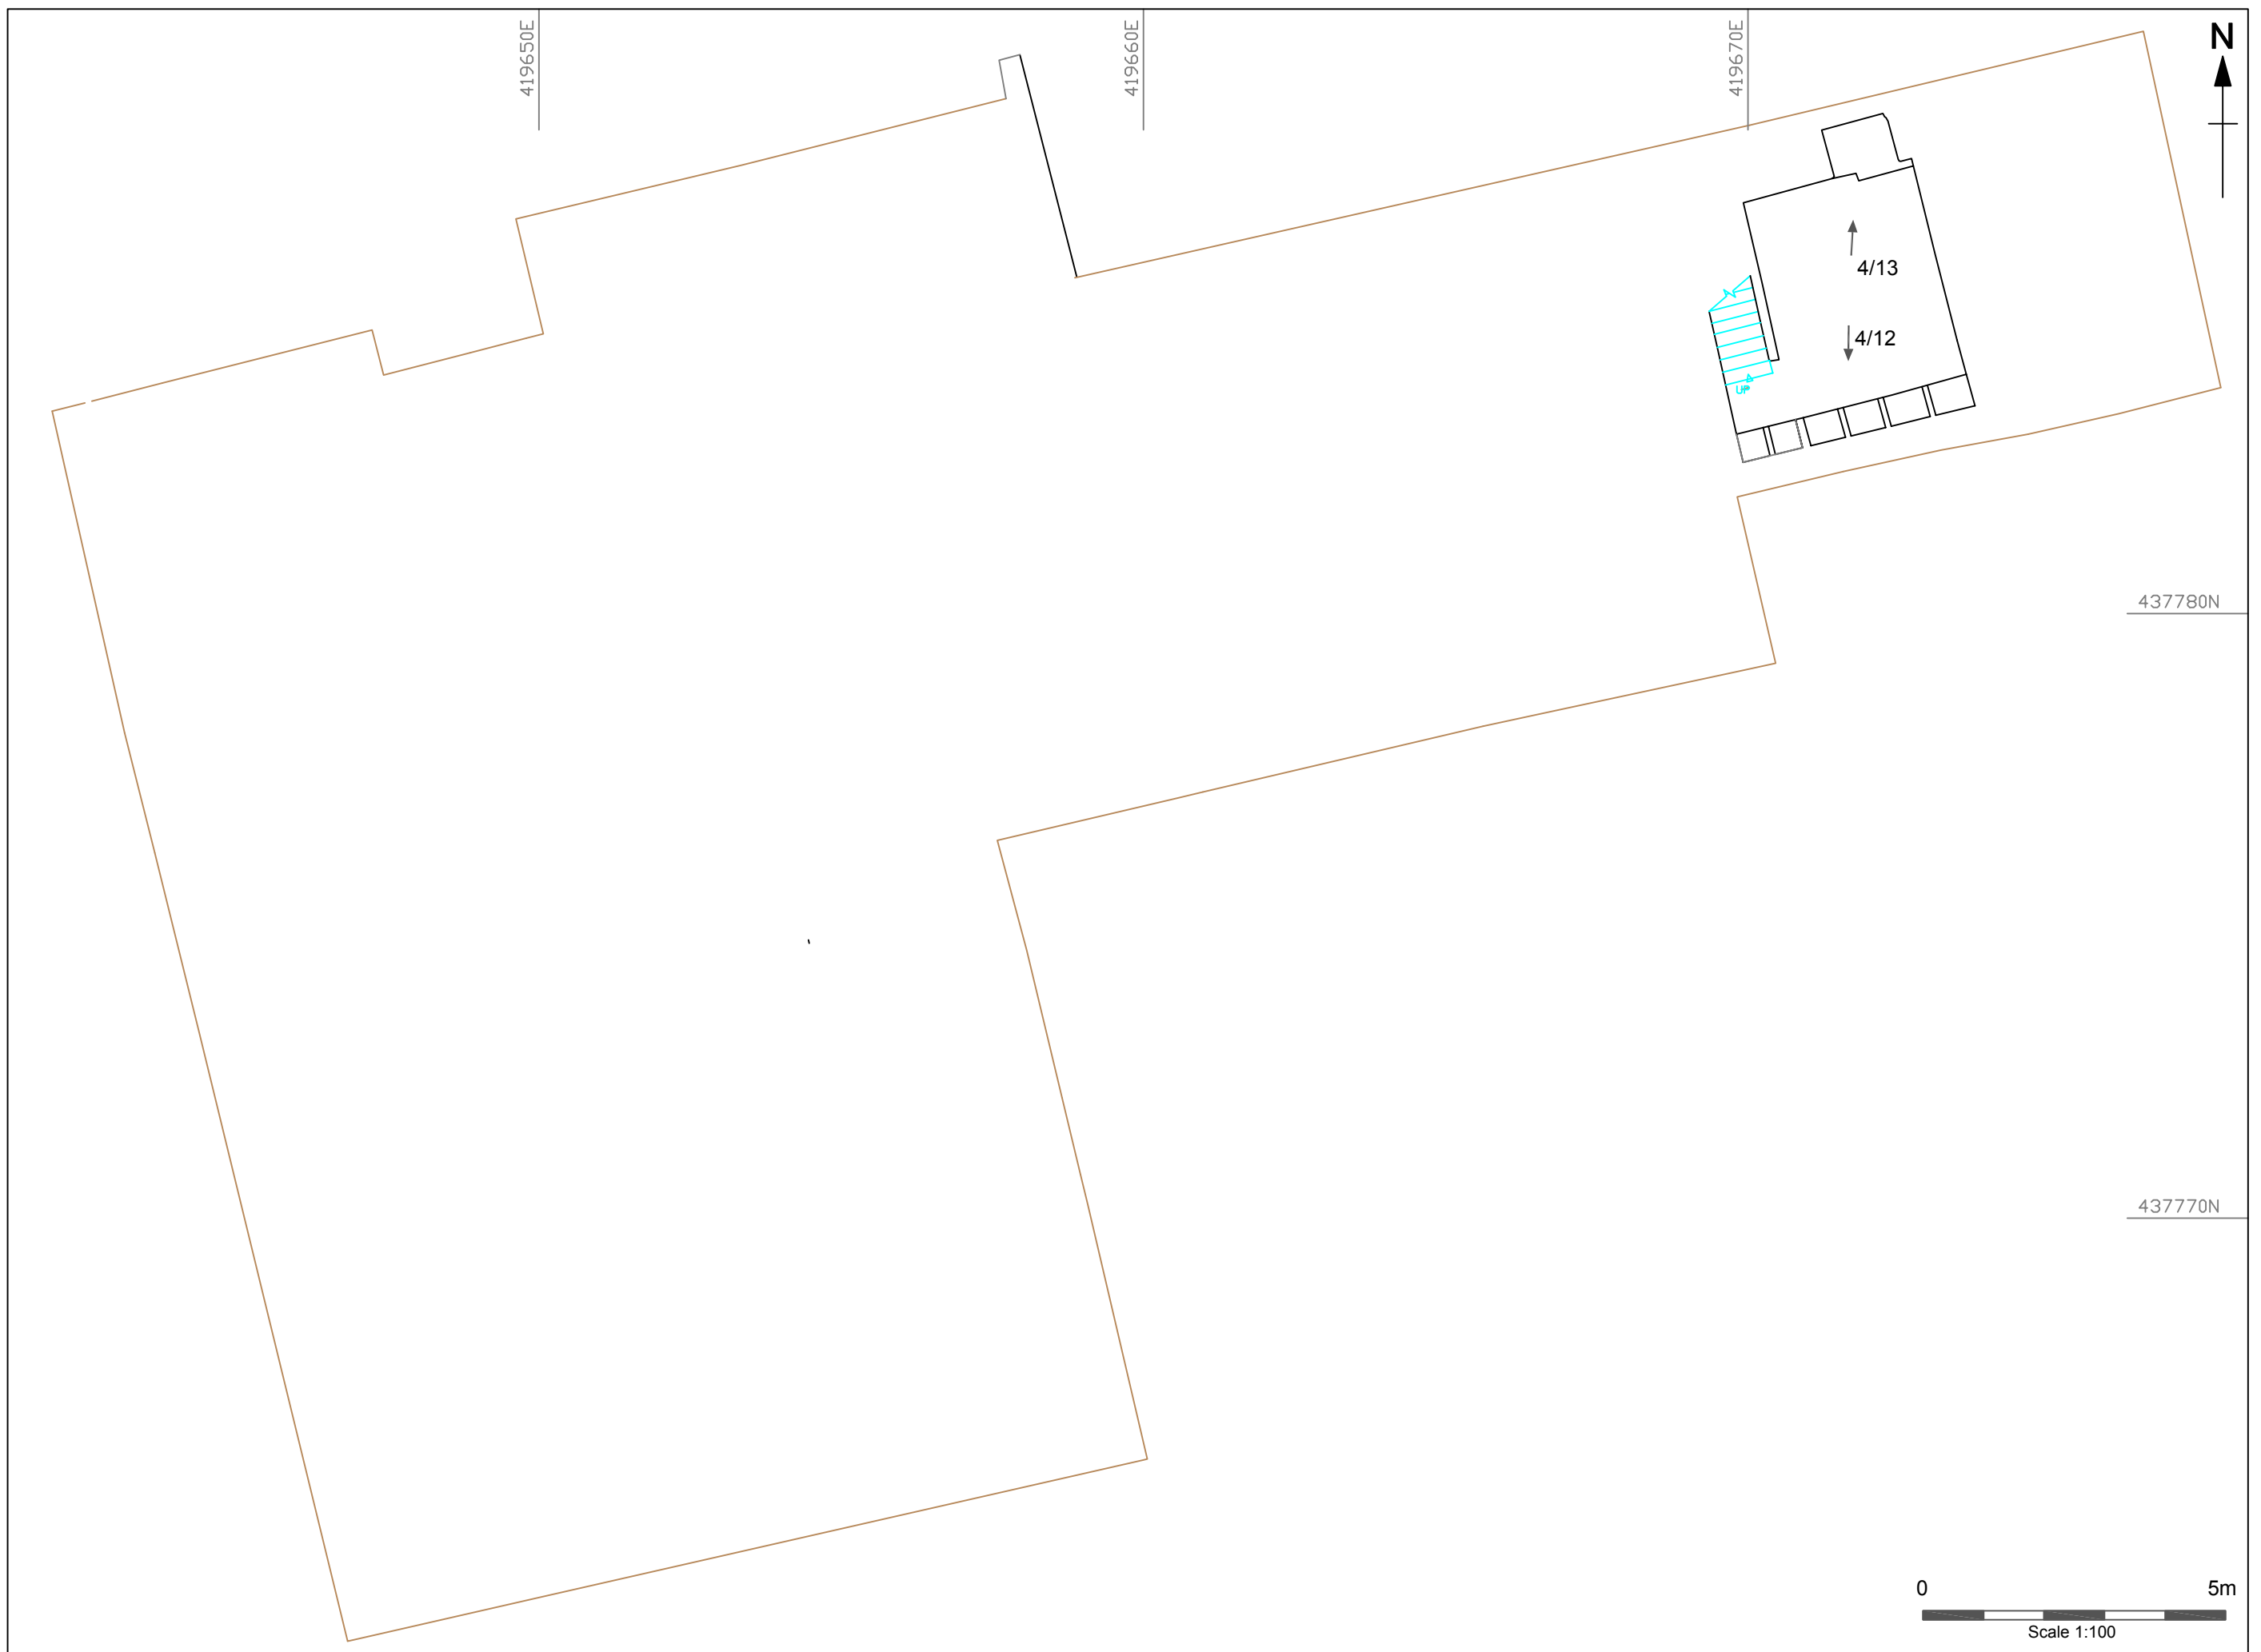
Shaw House Farm: Barn and Cottage Cellar Plan.
